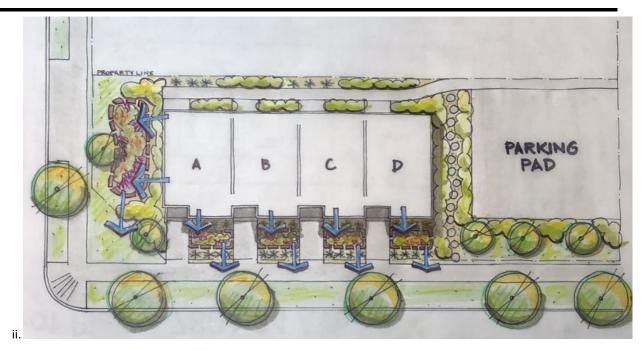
Typical 4-Unit Plan View Layout – Mixed LID Facilities
